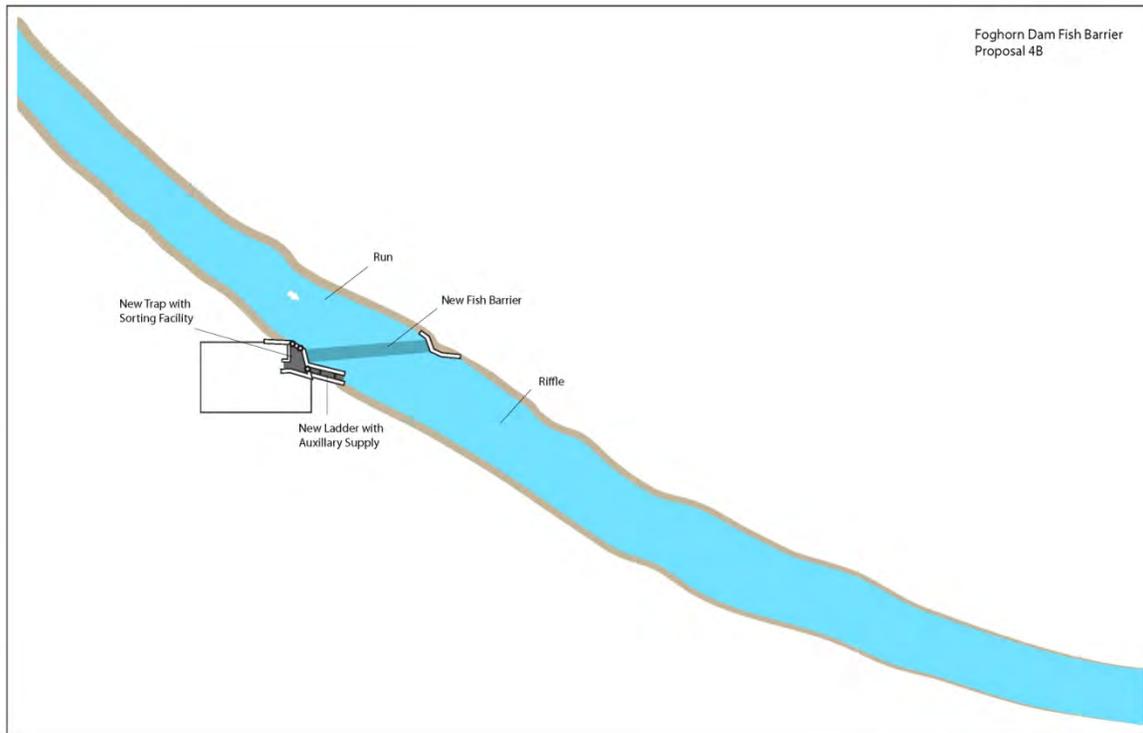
Illustration of the new trap with sorting facility and new ladder with auxiliary supply.
